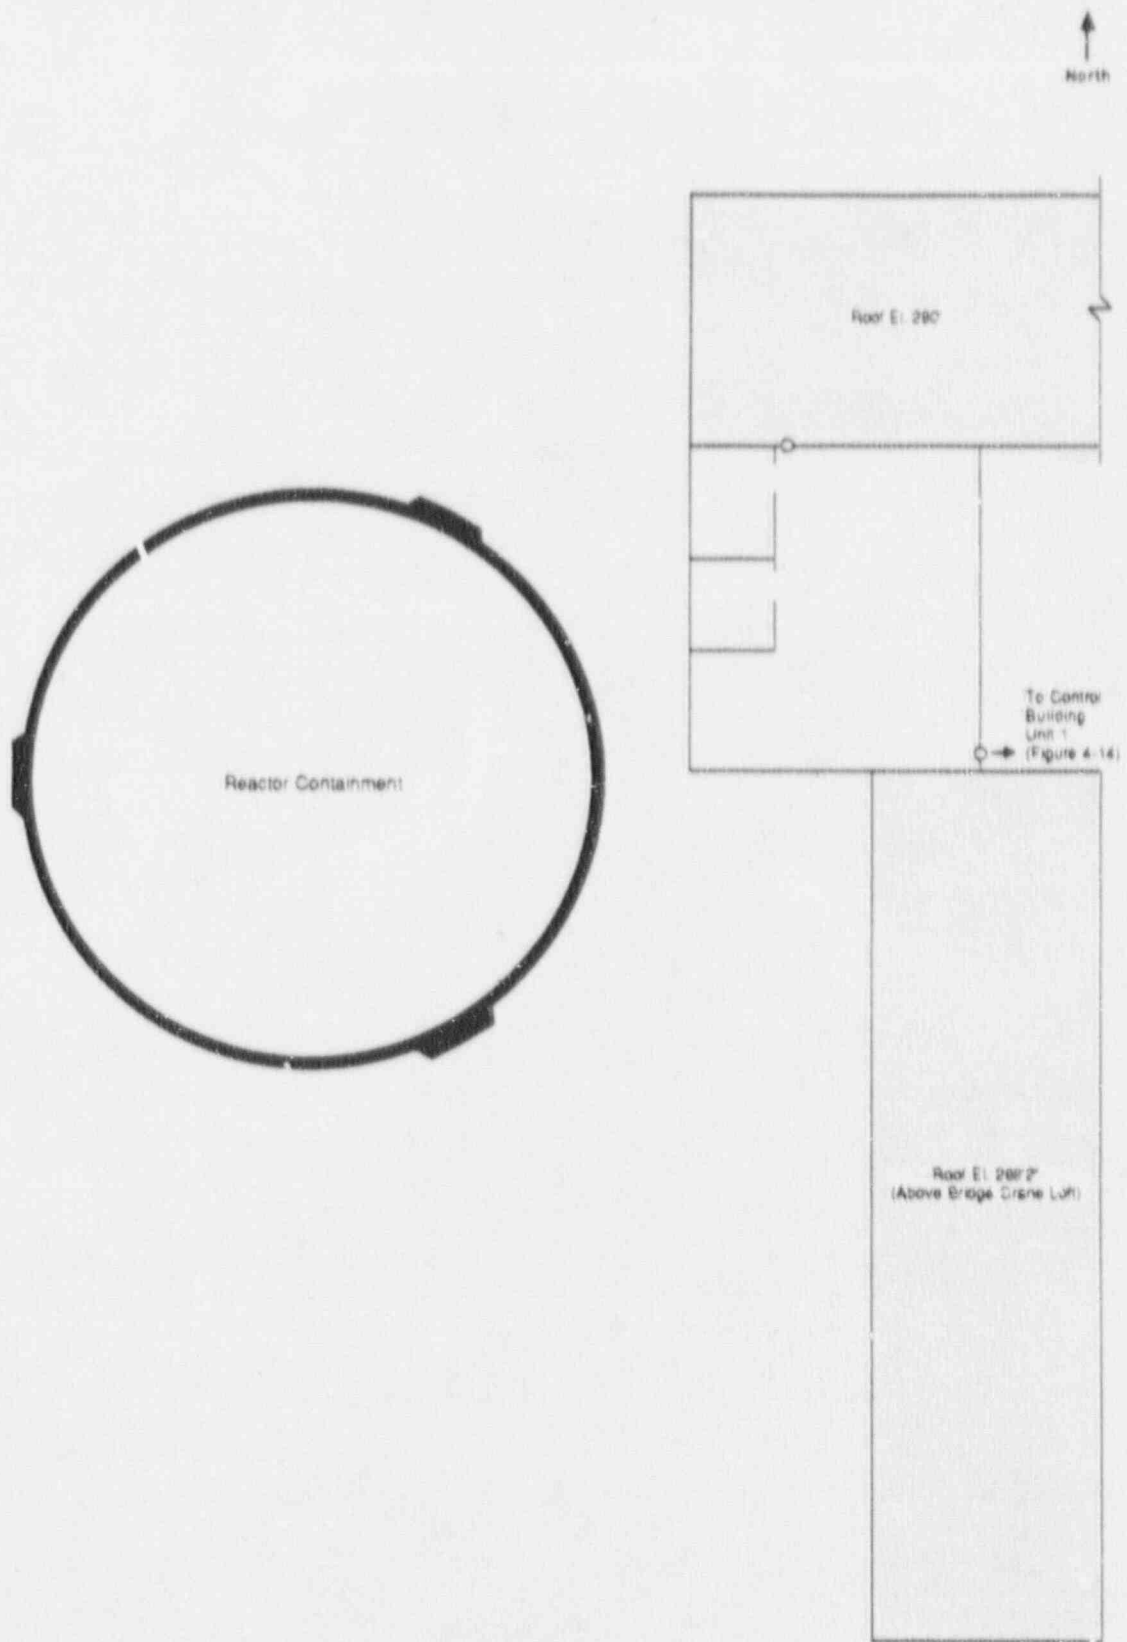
Vogtle 2 Reactor Containment, Control Building, and Fuel Handling Building, Level 4 (Elevation 280'-0")
